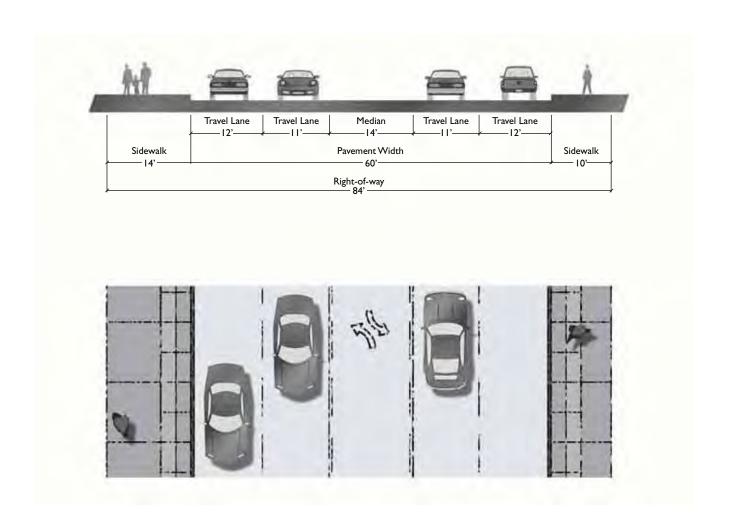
Widened Sidewalk (with distinctive paving). Construct a new highway cross-section within existing right-of-way that includes a 14-foot sidewalk behind the north curb line of the highway. The additional width would be available if the lane and median widths were reduced from the HDM standards (Figure 2). The wider sidewalk could be part of gateway treatments at Elm Street, Grant Street, and Ivy Street. Distinctive pavement treatments could include concrete scoring, colored concrete, or unit pavers. Pavement treatment could be coordinated with options for intersection improvements (pages 13–14).
